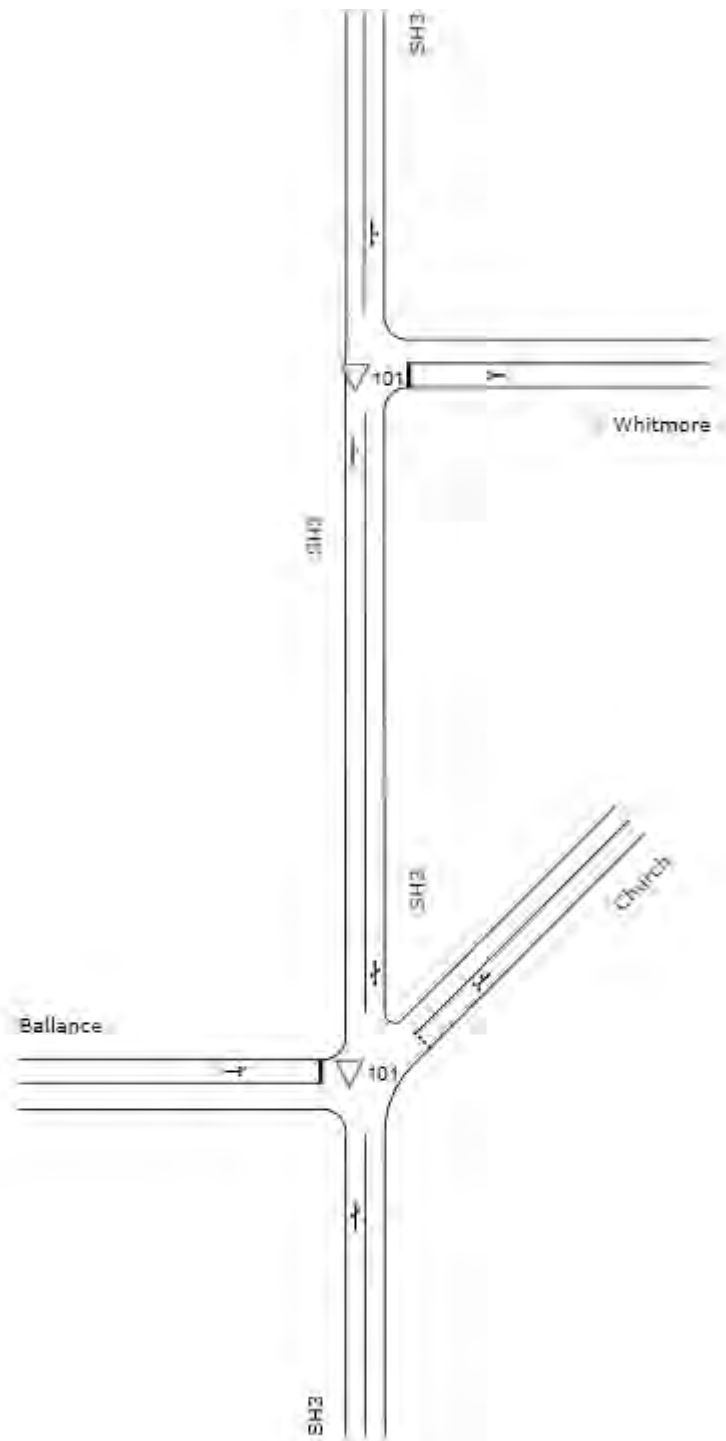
Sidra Intersection Diagram – State Highway 3 / Whitmore Street / Church Street / Ballance Street
